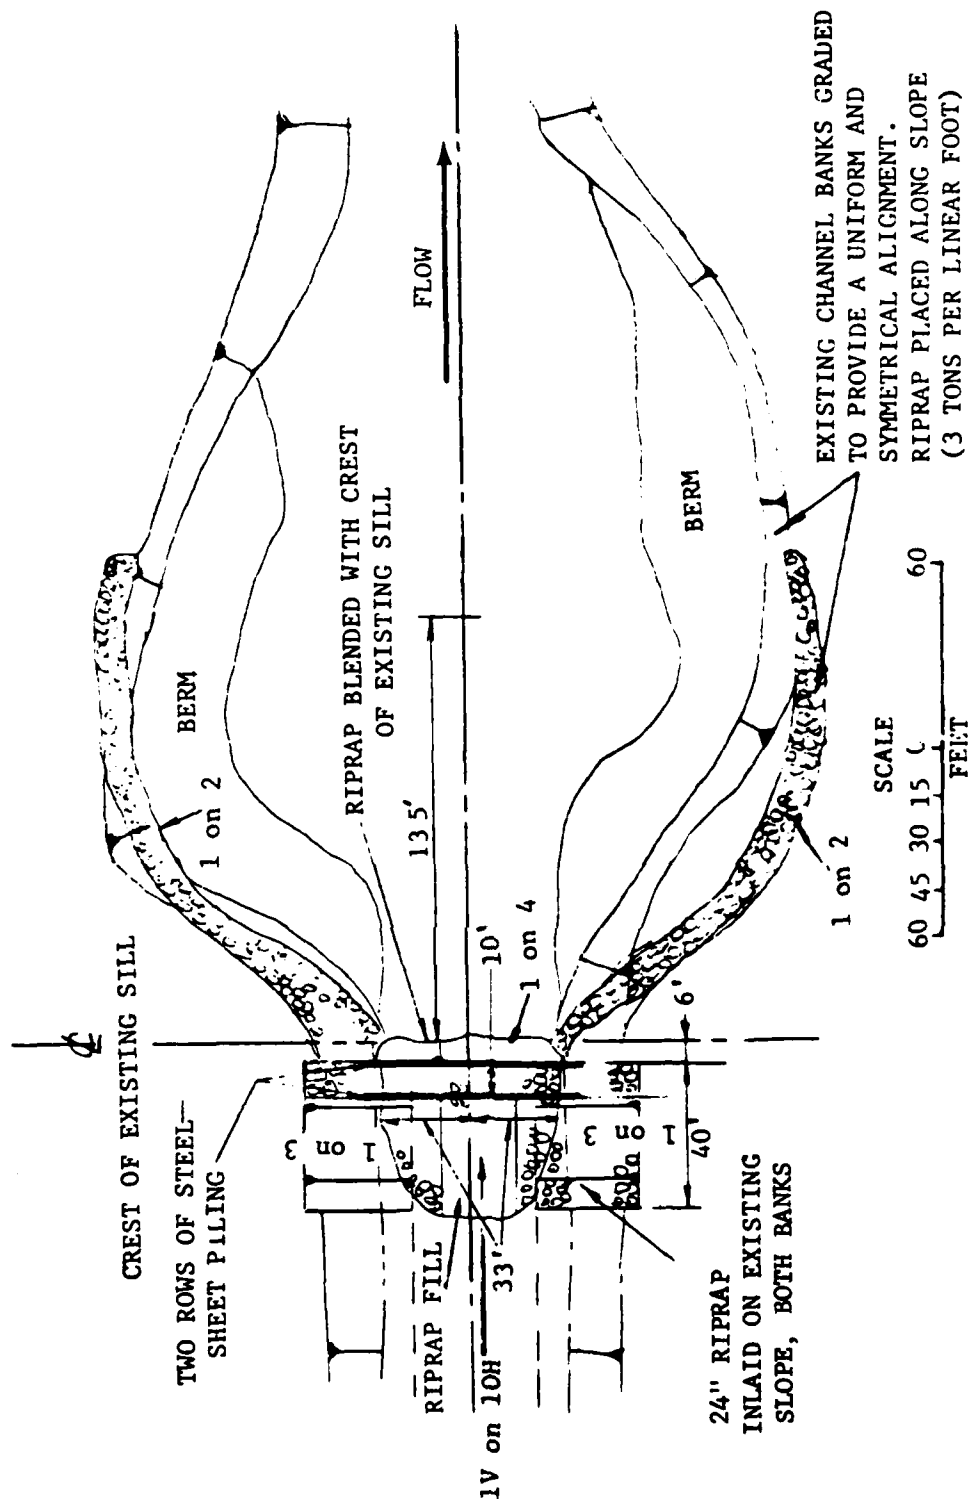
West Fork Ditch at Onawa, Iowa. Plan view of 1973 sill modification.
